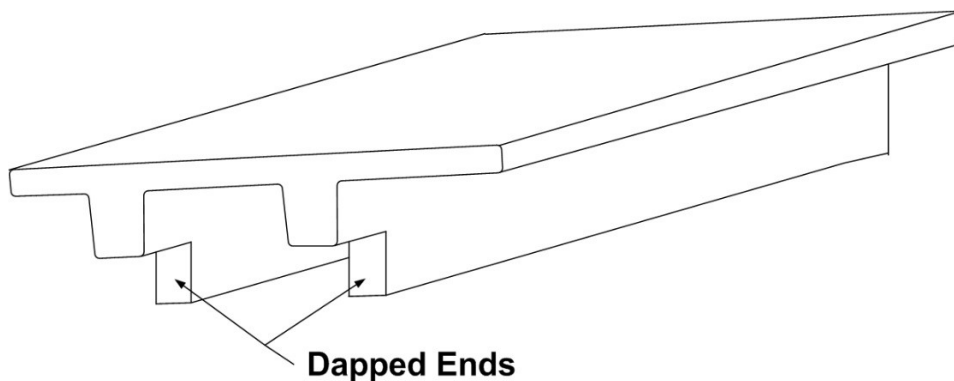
Dapped End of a Prestressed Double Tee Beam
